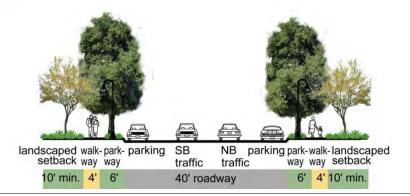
B Getty Drive and Cape Drive: Cross Sections— Looking West
